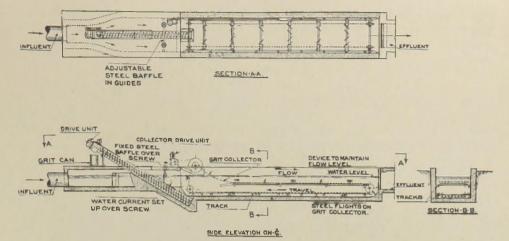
Plan and Elevation Drawing of Link-Belt Straightline Grit Collector and Washer, showing arrangement of collector mechanism and screw conveyor washer.
